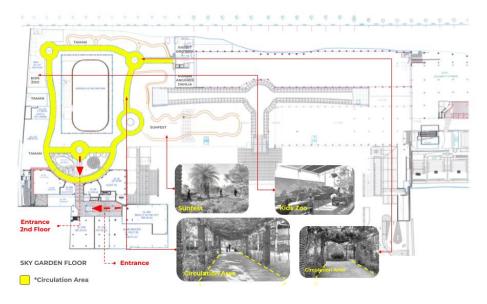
Sky Garden Floor Plan (Author, 2025)
